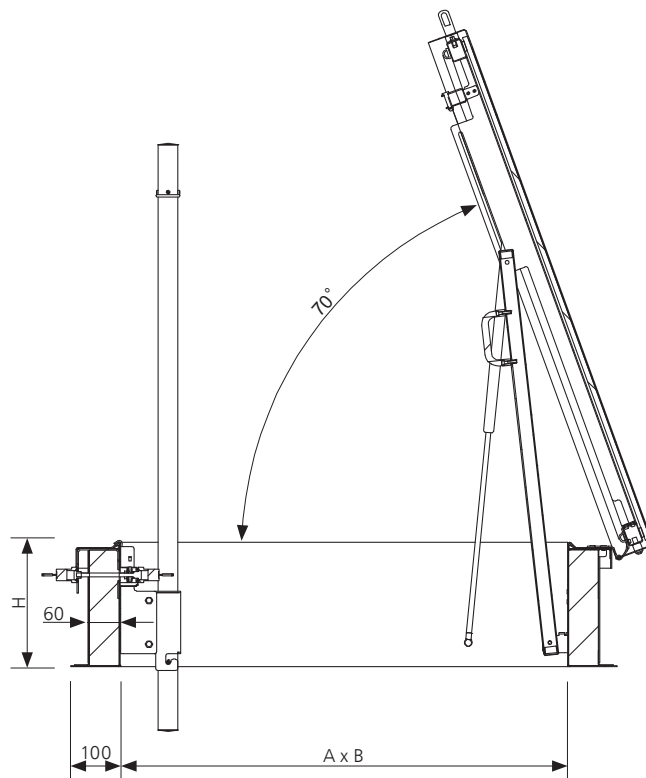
Section B-B of mcr PROROOF LD roof hatch in open position (over a ladder), dimensions in [mm]
